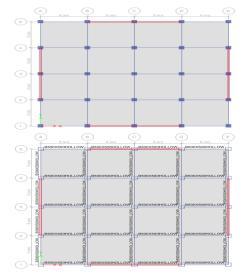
Plan of 5 Bay 5 Storey of Solid and Hollow (Boxtype) RC Frame Building
